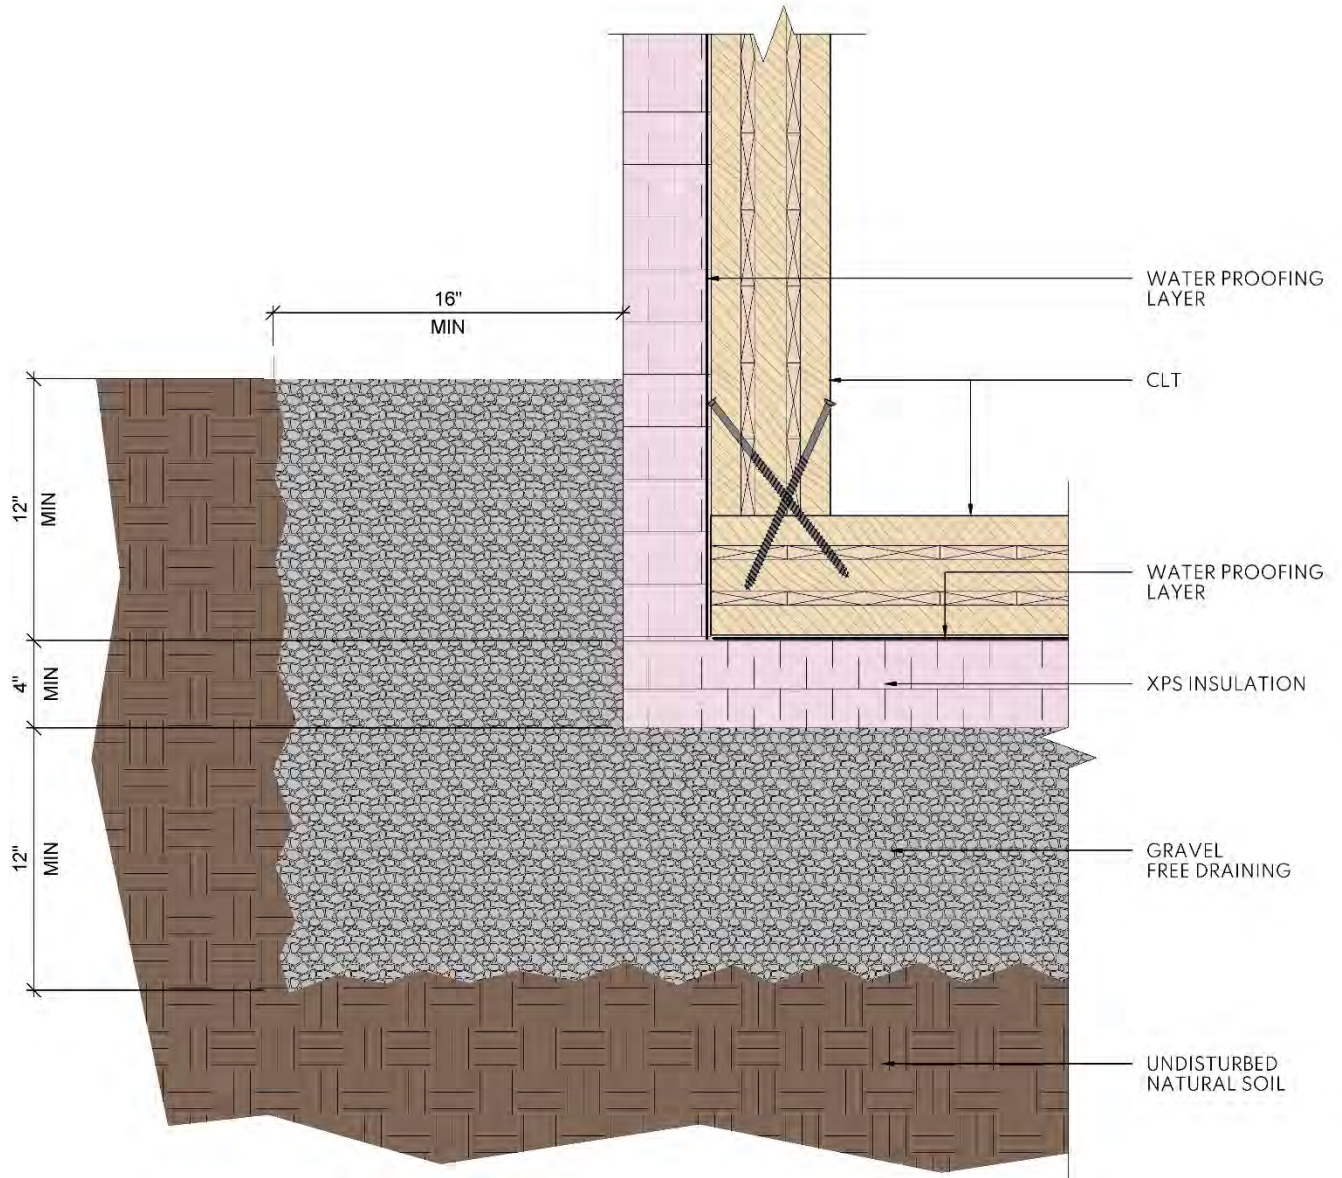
MT CLT slab and exterior wall of building detail for Slab on Grade (SOG) Buildings.
